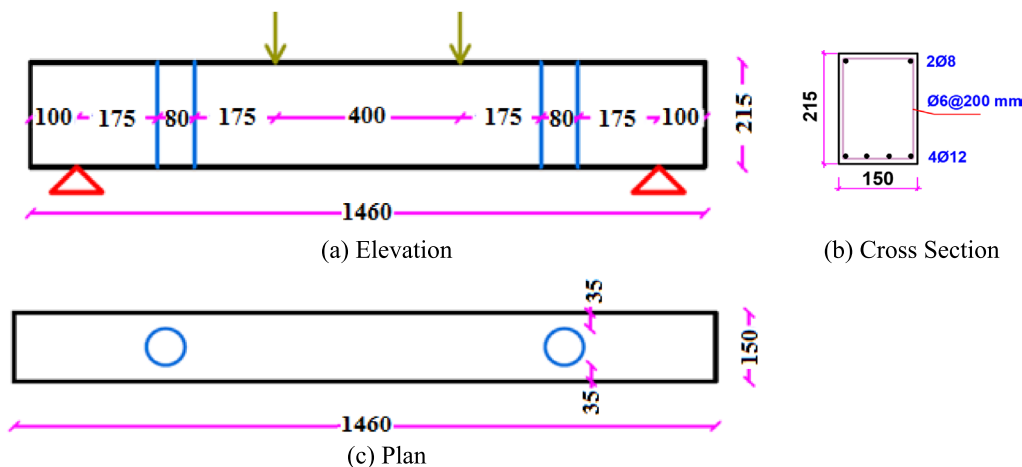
Dimensions of beam specimens and the location of the one opening in detail. (Dim in mm)
